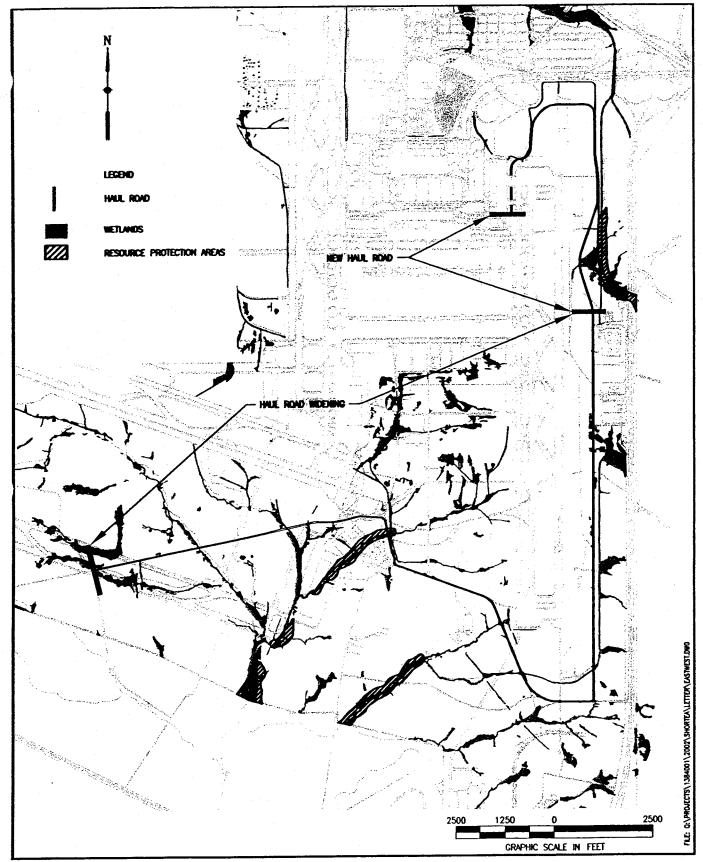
NORTH CONSTRUCTION ACCESS ROAD(HAUL ROAD) PROJECT LOCATION MAP
